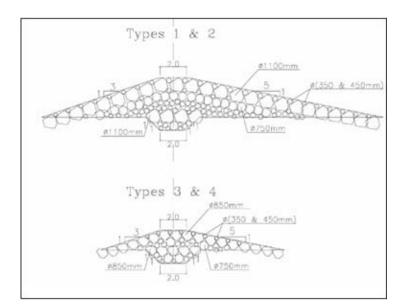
Typical cross sections of 3 m and 1.5 m high check dams at wadi Bahman , Yemen
